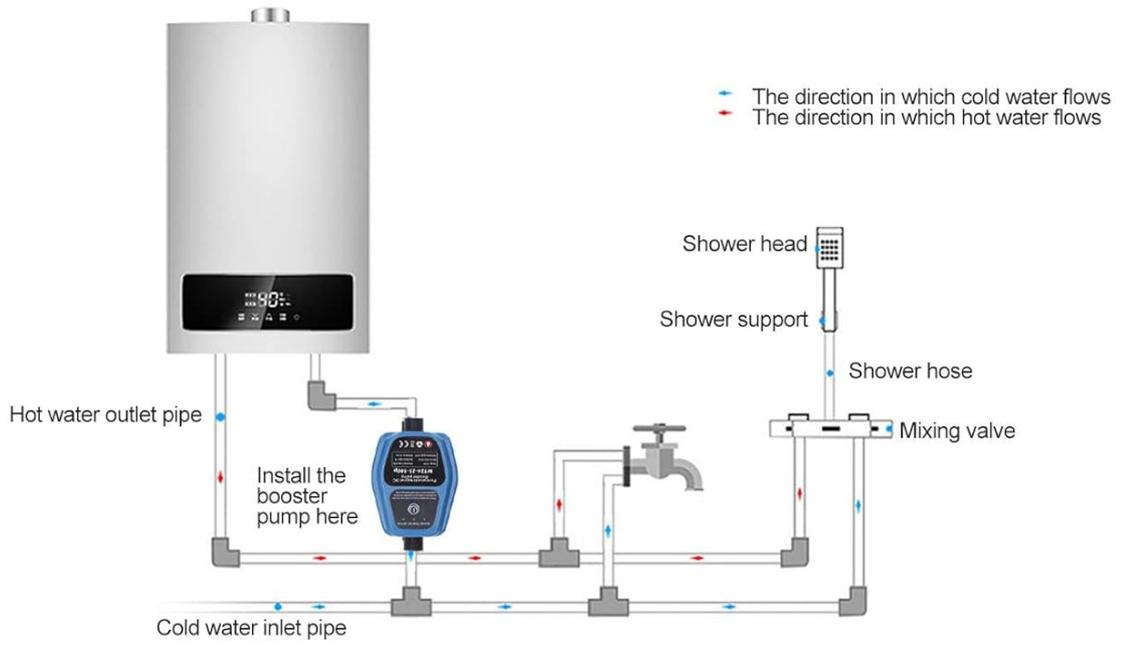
Installation examples for faucet and sprinkler systems. The pump should be installed on the cold water inlet pipe before the mixing valve.
